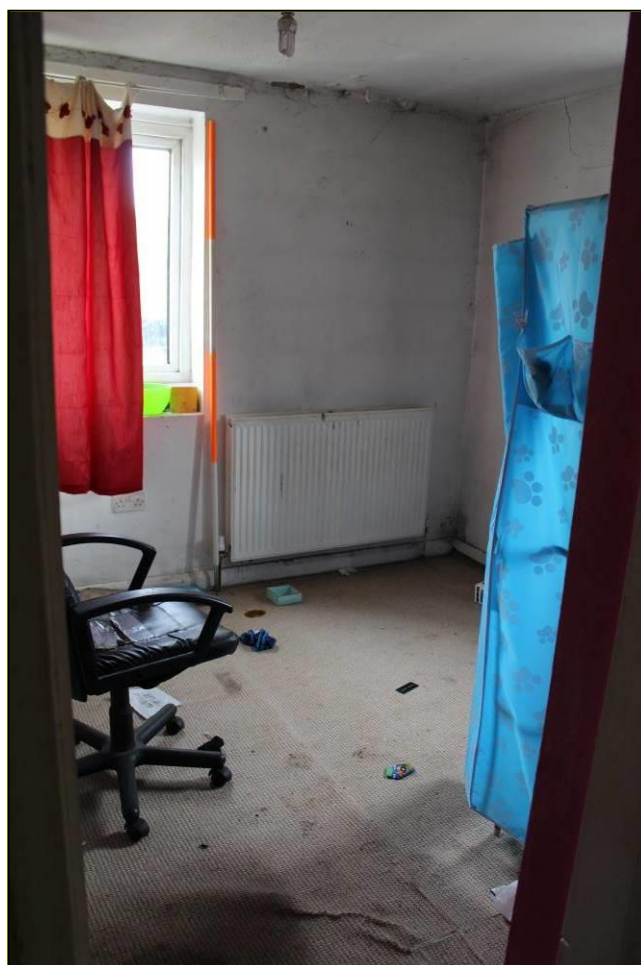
Building A: Room A2.11: view northwest, 2m scale
